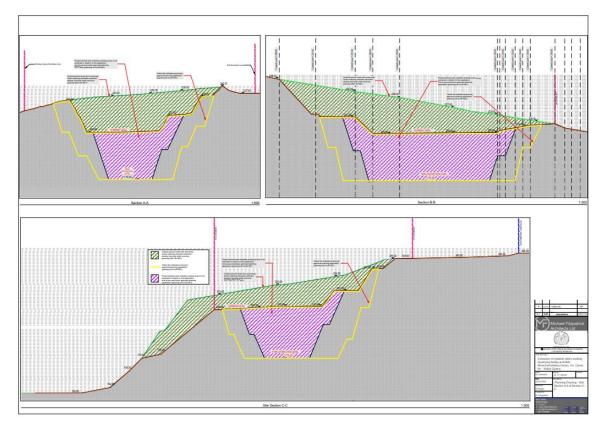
Site Section showing location of proposed extraction and area requiring archaeological monitoring.
